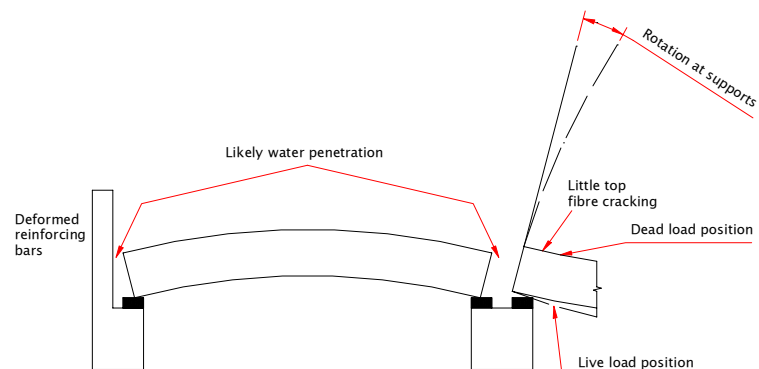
Schematic drawing of type of cracking & deformation due to hogging and creep in pre-stressed elements
